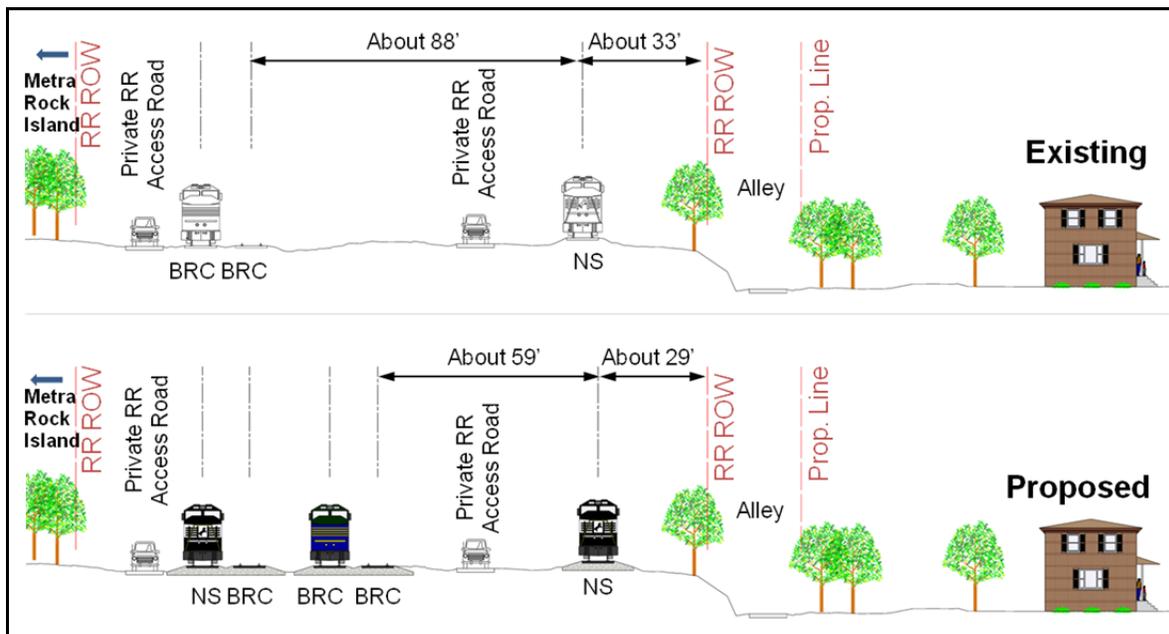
Alternate 80-2 and Existing Conditions, Looking North near 79th Street
